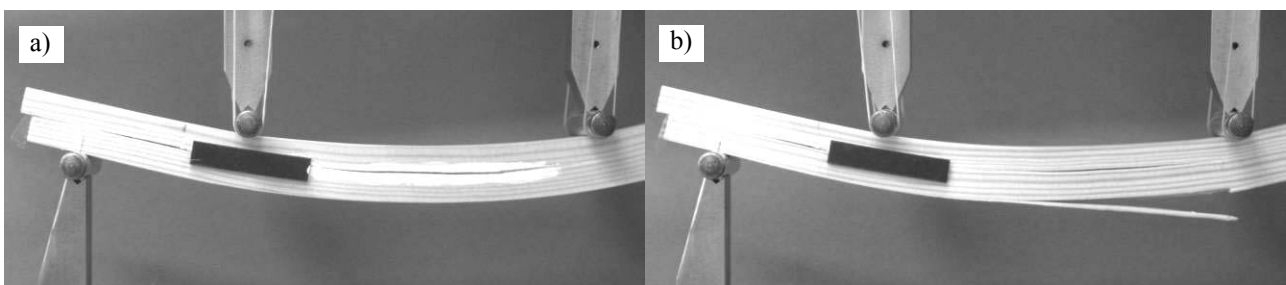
Crack propagation at the horizontal shear crack tip (a) and pure tension failure below a loading cylinder (b) for a $L_p=45$ mm repair.
